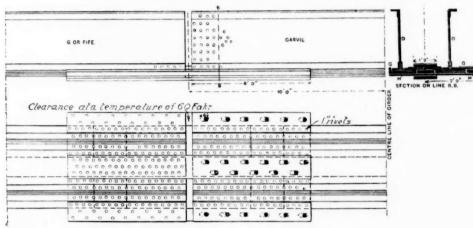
Temporary Connections for Bottom Boom of Central Girders. FORTH BRIDGE-ERECTING AND JOINING THE CONNECTING SPANS.
